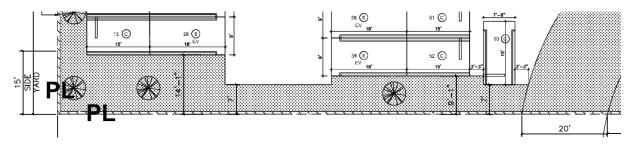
Southern yard showing a minimum 7-foot landscape buffer, with a maximum 14-feet.
